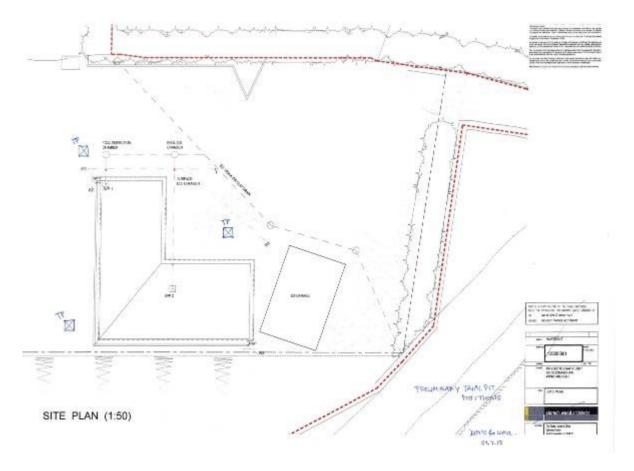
Proposed test pit location. wma Consulting Civil & Structural Engineers.
